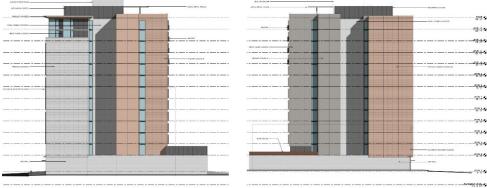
and 3. The proposed project, view from O'Farrell Street, looking west (left) and looking east (right). Brick, September 2018.
